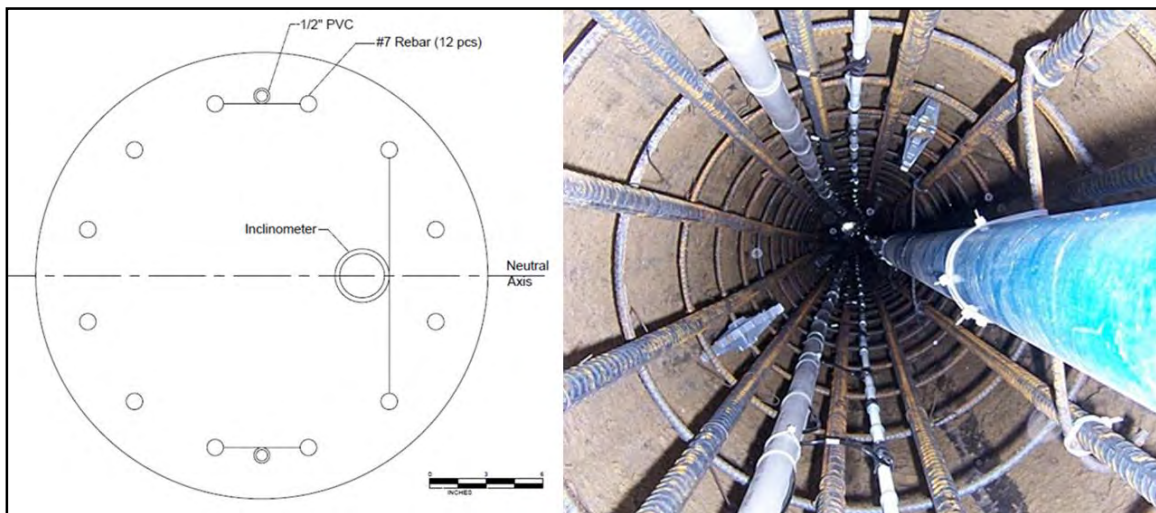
Plan view of instrumented rebar cage before concrete placement.
